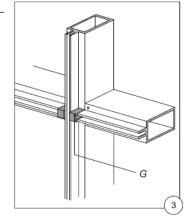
Stick system — joinery — typical horizontal/vertical connection
